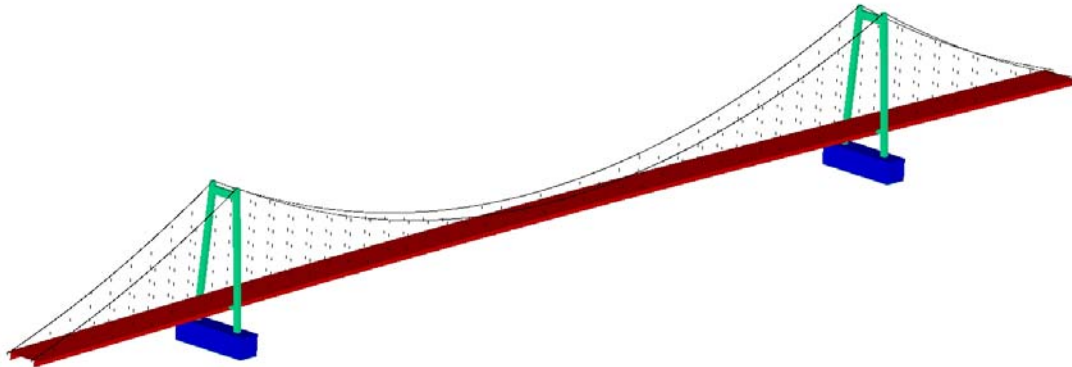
Detailed FE model of the Rhine bridge Emmerich
